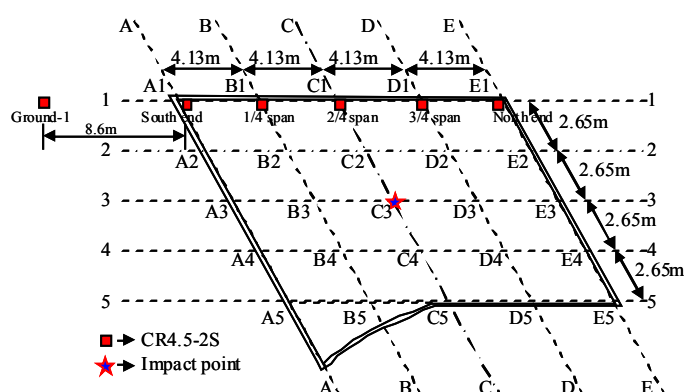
Plan view of Yoshida Bridge with sensors configuration and impact locations
